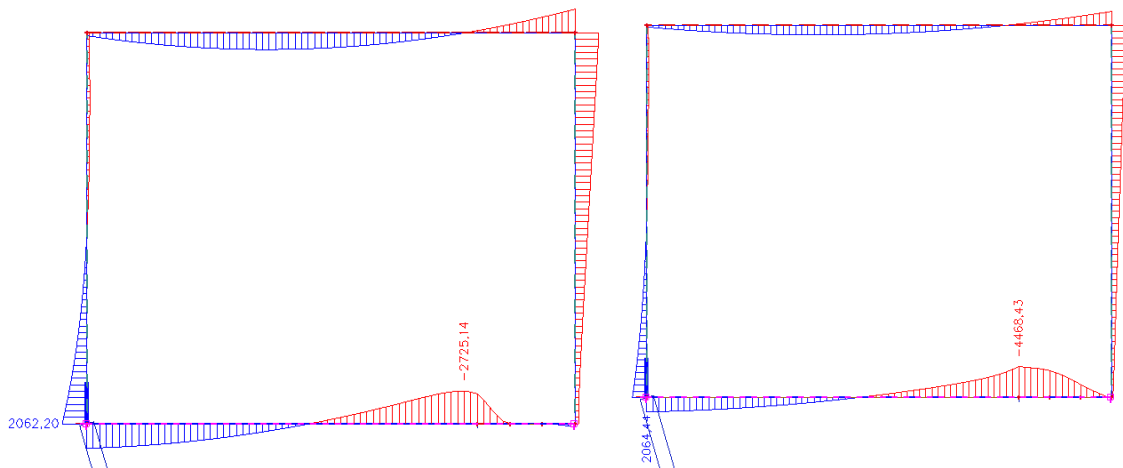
Moment diagram, load situation: Vessel, left: cross section through the opening, right: cross section between openings
